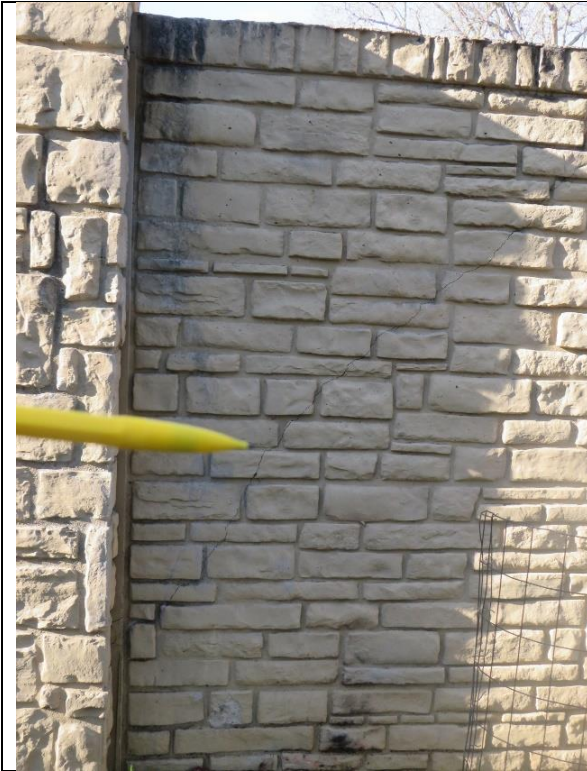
Crack in Panel 5 and interior of 4165 Stinwick Lane.
